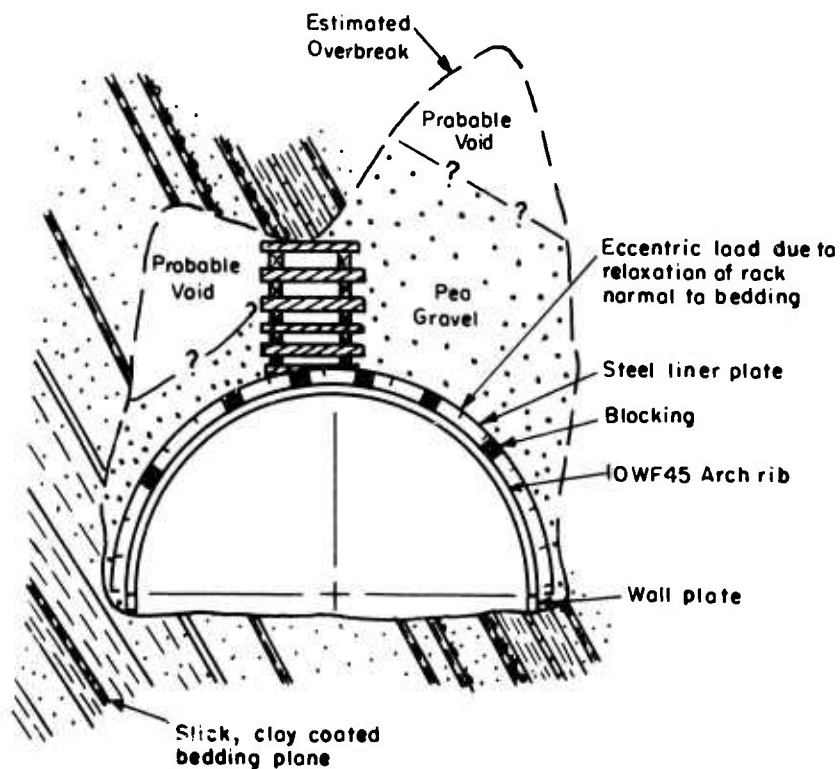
B TOP HEADING OVERBREAK - CASTAIC DIVERSION TUNNEL. (after Arnold et al., 1972)
